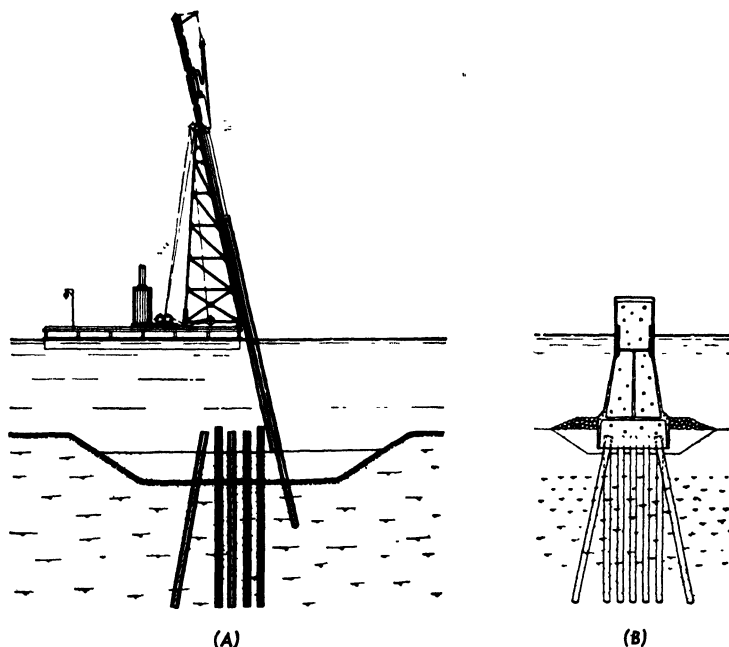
Steps in the construction of a special type of bridge pier in Denmark. (A) Piles are driven by means of a follower. (B) The caisson was floated and sunk over the piles; compressed air was used in the working chamber to permit its concreting in the dry. (From A. Englund, Ref. 117, 1936.)
